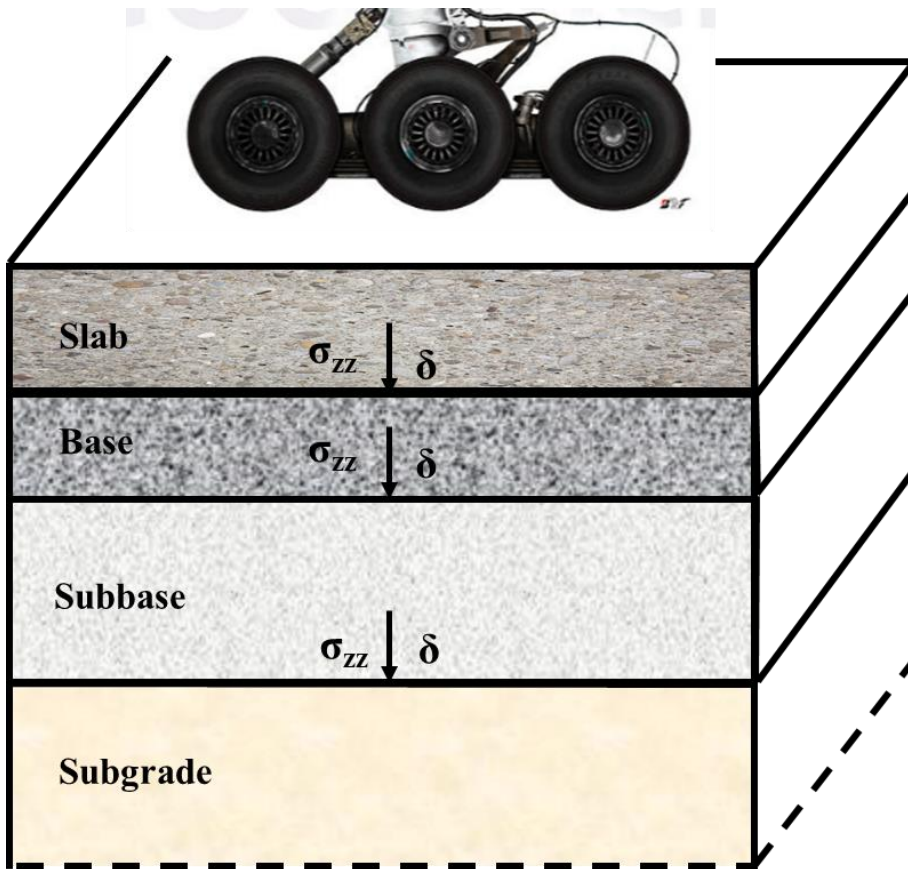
Some critical pavement responses for rigid airfield pavement foundation sublayers.
